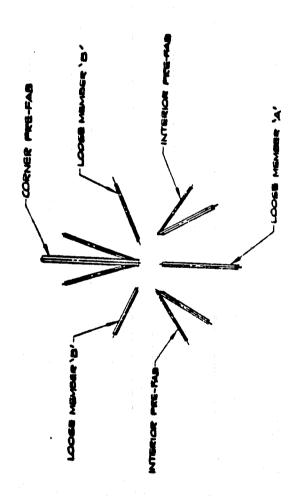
Joint detail. (Excerpt from Drawing 6848-002, Sheet 2)
